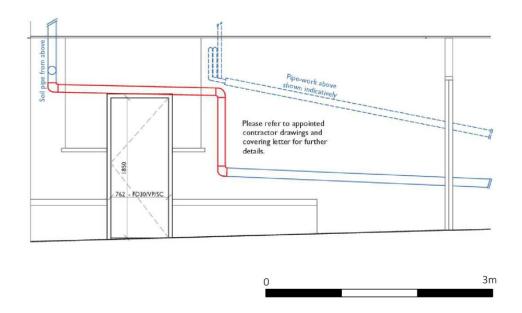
Proposed new opening in north wall of the office (scale 1:75)
